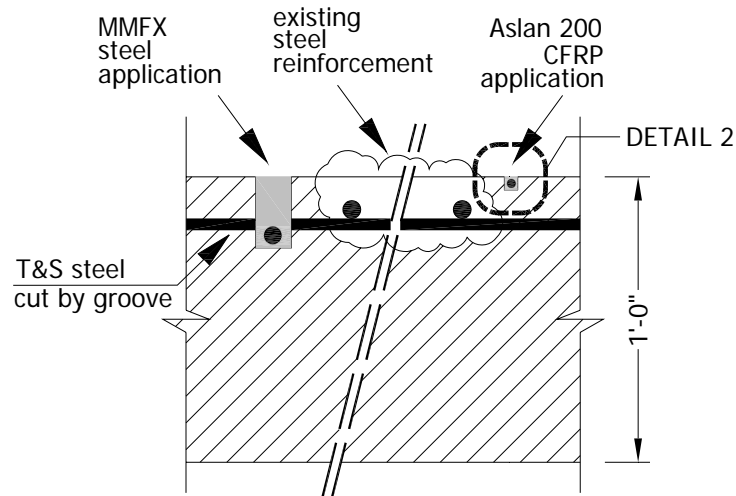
Cross-Section Detail 1 (See Figure 2)
